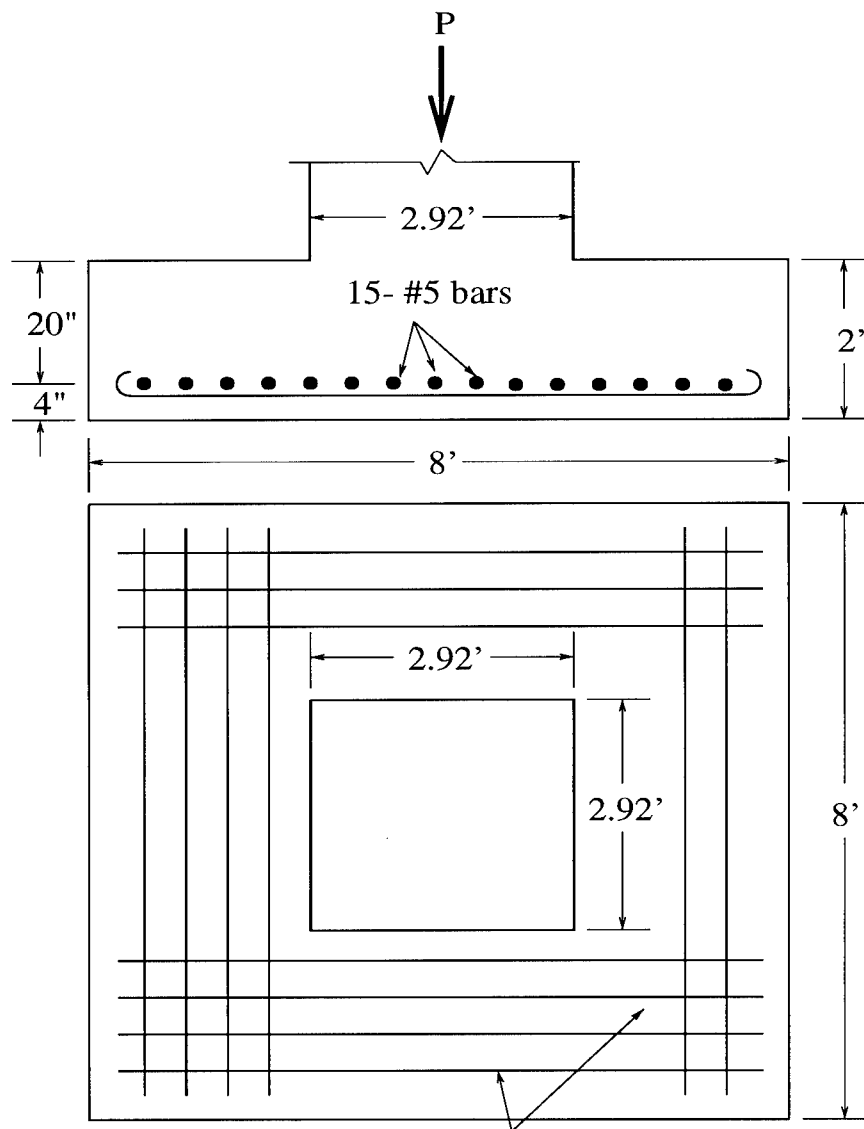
Dimensions and Location of Steel Reinforcement in the Column Footings
